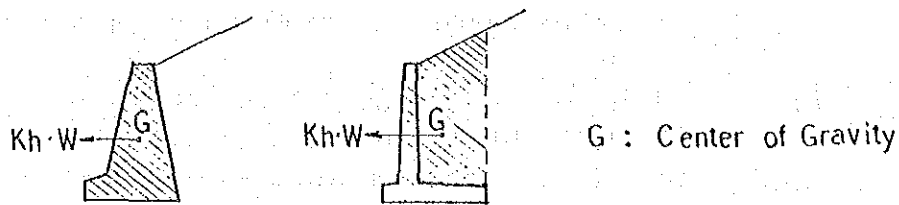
INERTIAL FORCE OF RETAINING WALL DUE TO EARTHQUAKE
